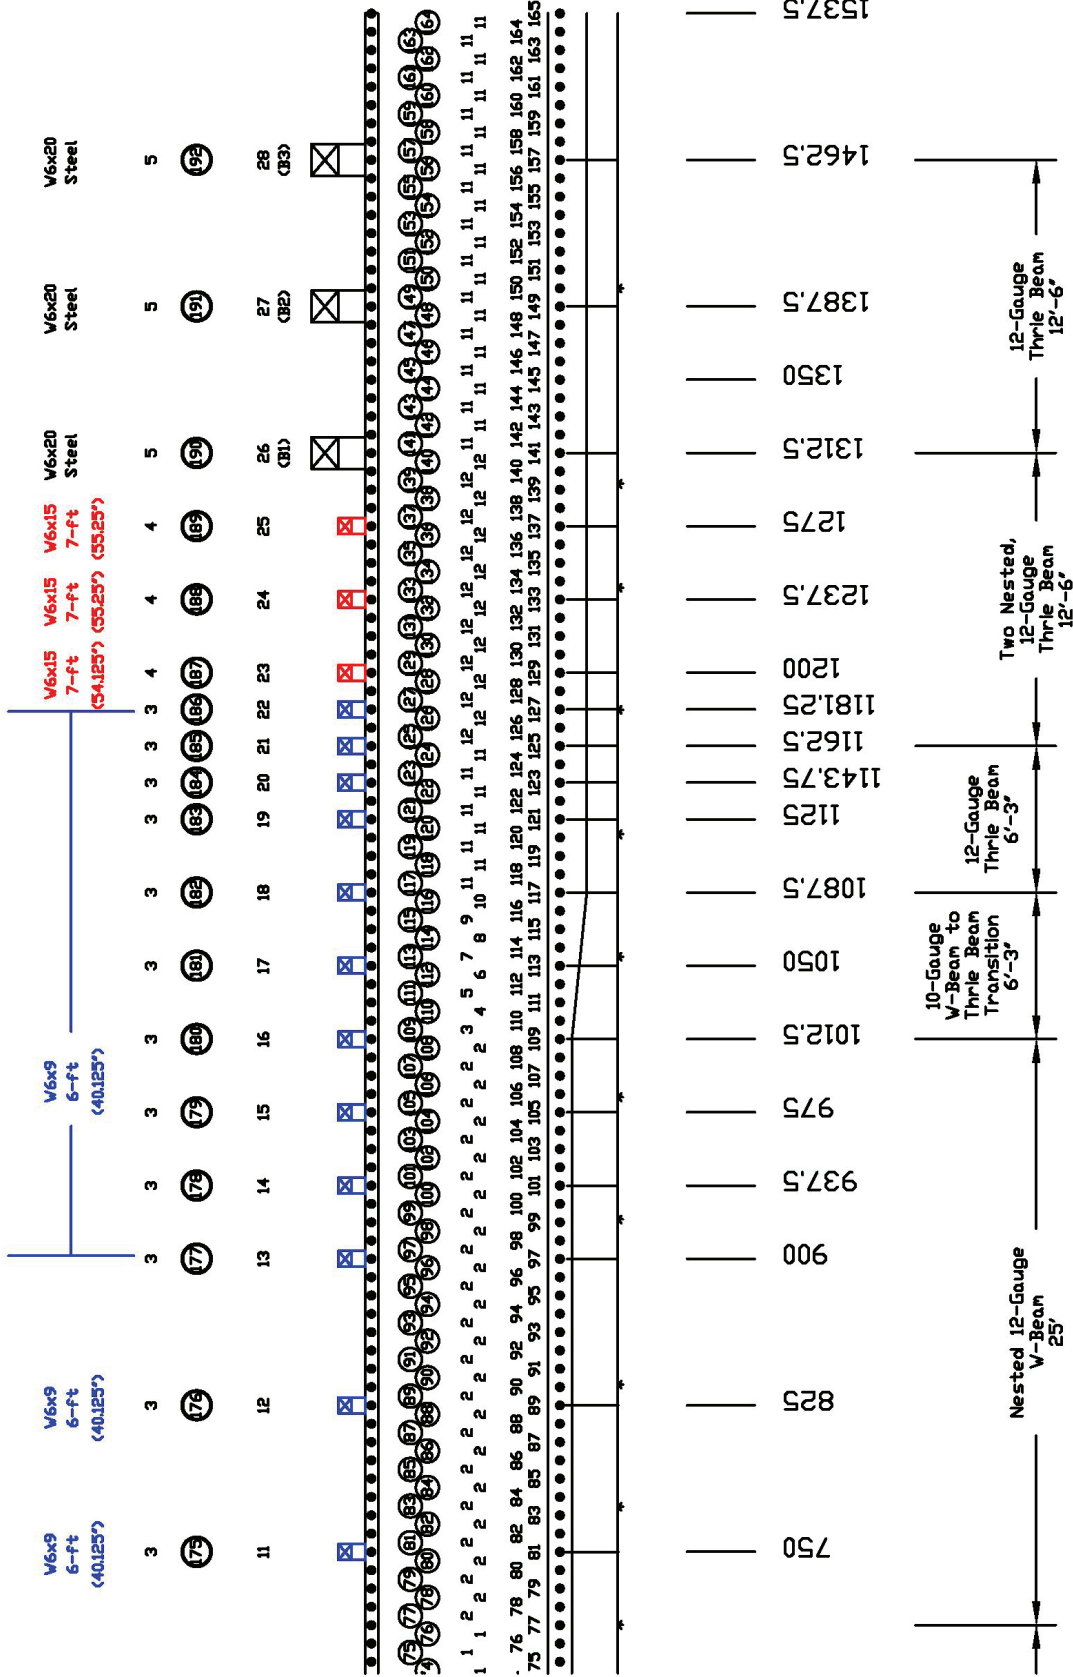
Layout Drawing of Design Configuration MGST-J (Continued)
